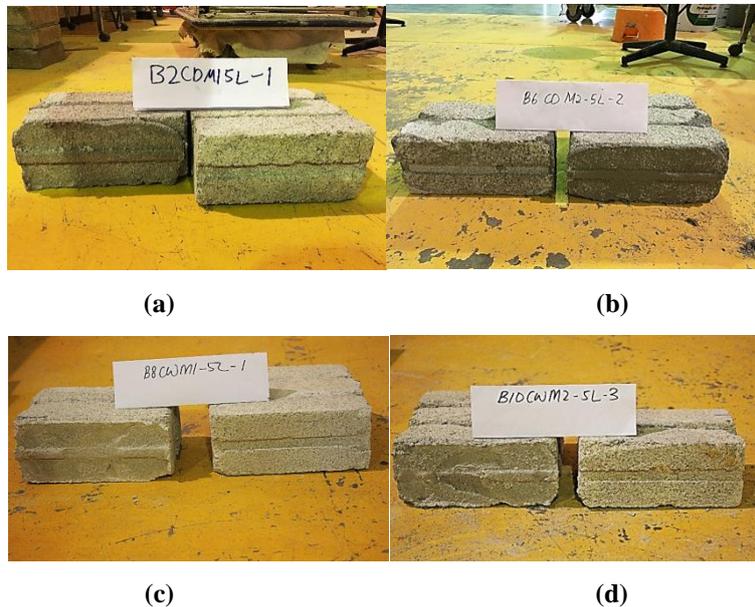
Failure mode of cement-sand masonry under flexural bond test
